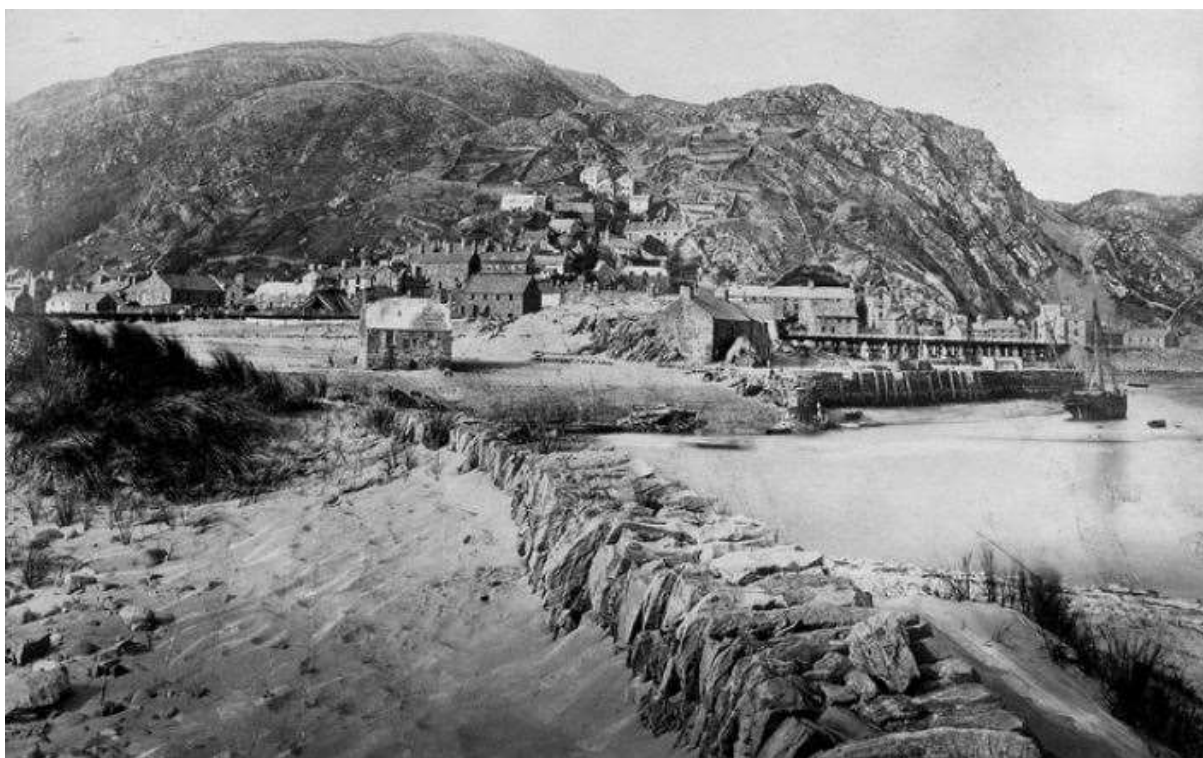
Late 19th century photograph showing a masonry retaining wall on the landward side of Ynys Brawd, opposite the Bath House.
